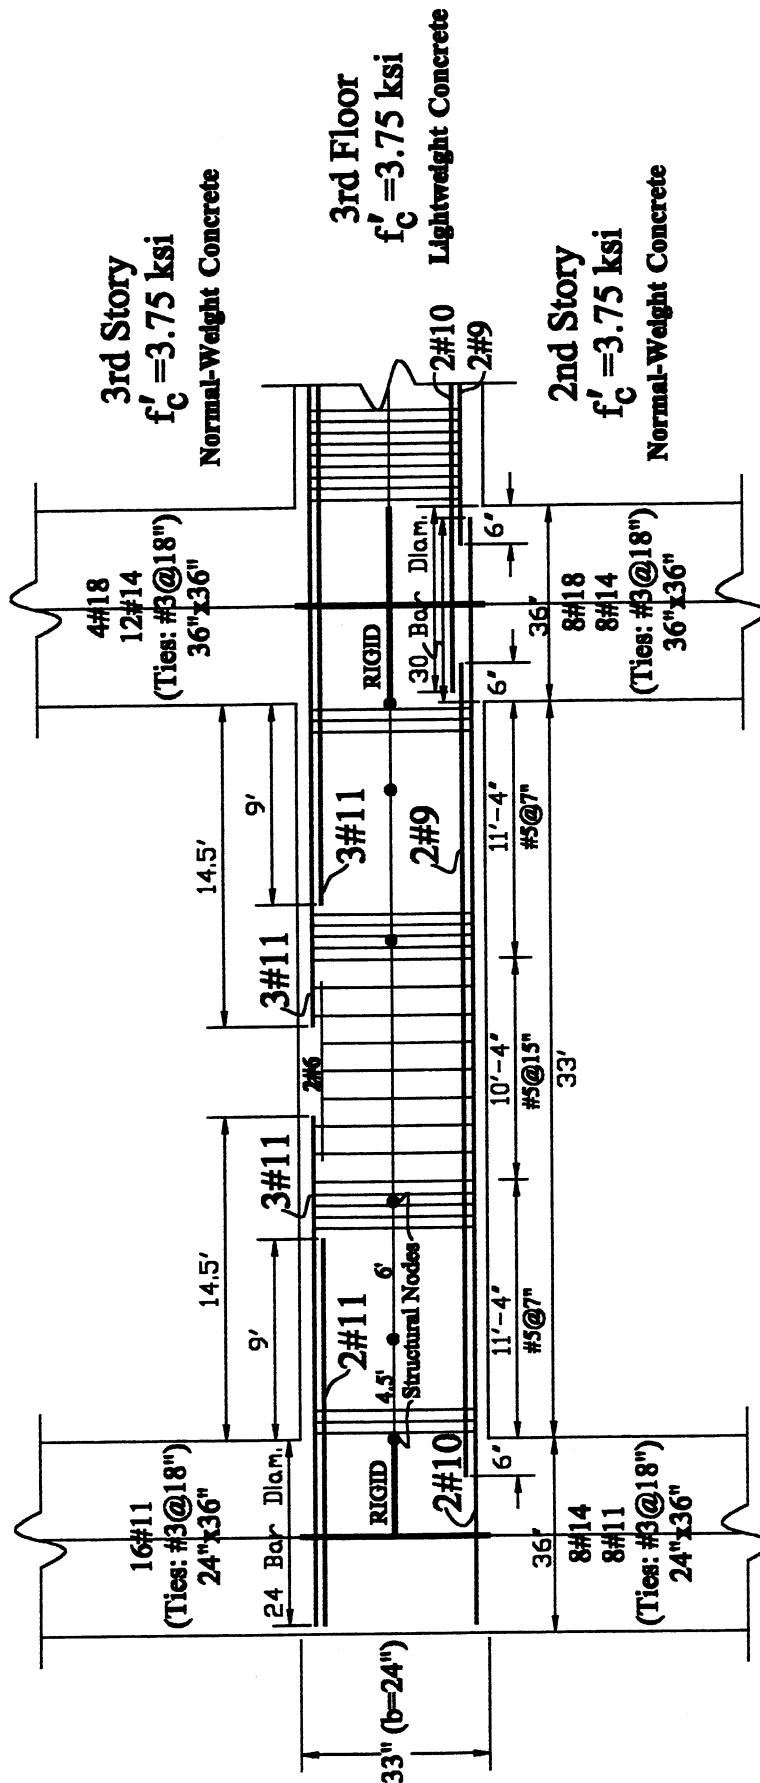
Reinforcement details for the 3<sup>rd</sup> floor beams of interior transverse frames.
